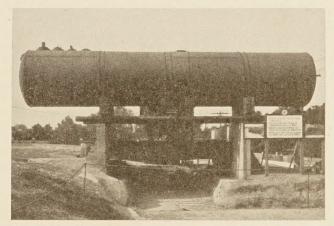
GENERAL ARRANGEMENT OF TEST SLAB, SUP-PORTING WALLS, AND TANK USED FOR THE APPLICATION OF THE STATIC LOADS
